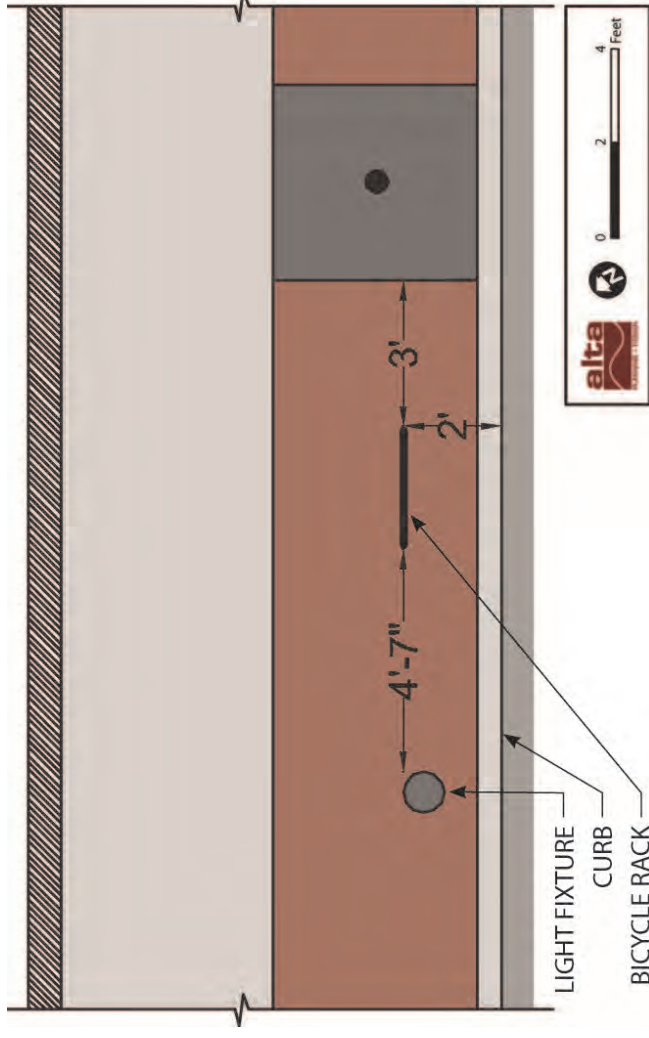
Ellsworth Avenue between 1st Avenue and 2nd Avenue Bicycle Parking Plan View
